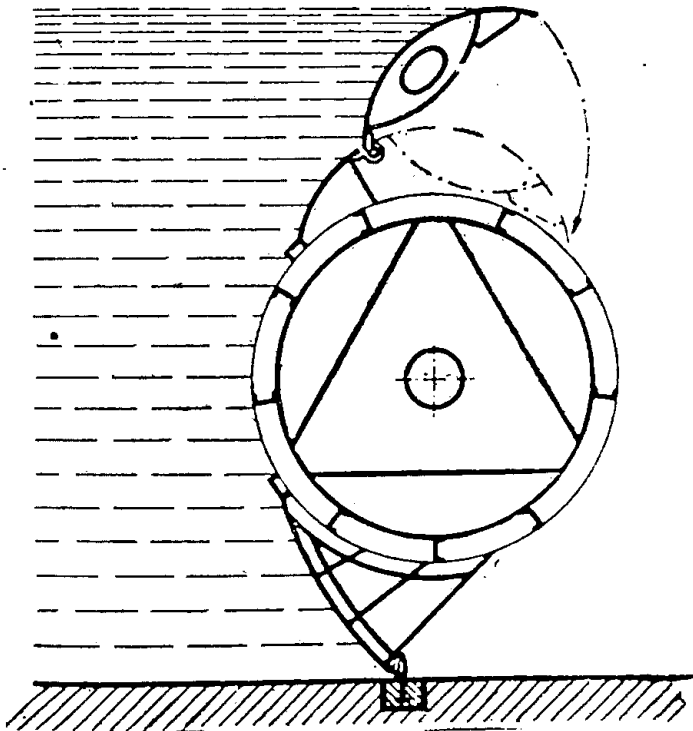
M.A.N. Roller weir with Fish-belly Extension Flap.
